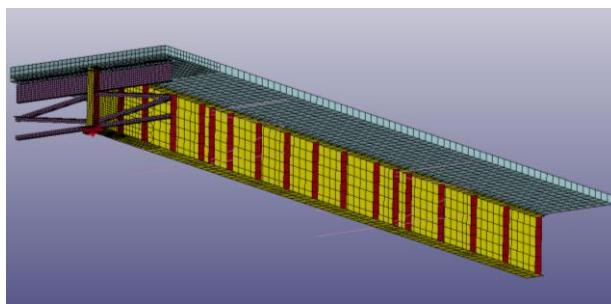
Full scale FE models of an interior girder from CT Bridge #818
